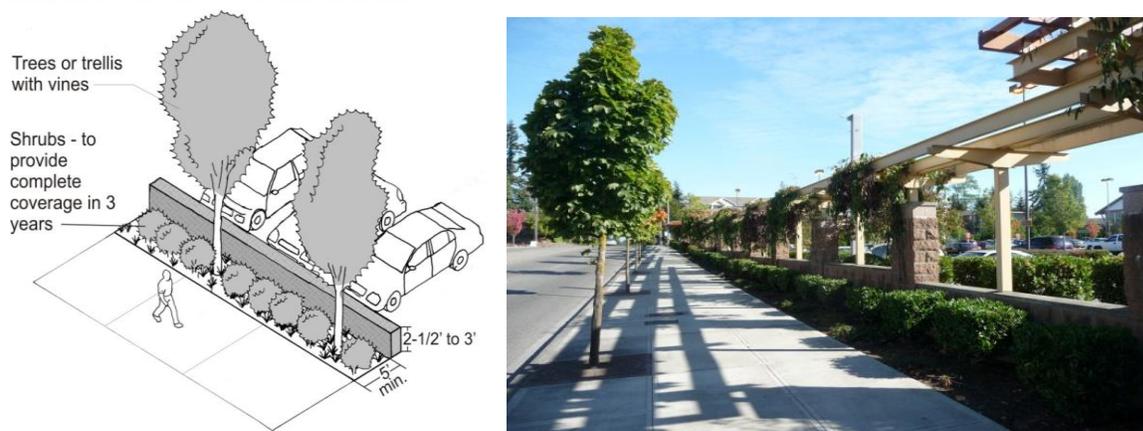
B.12: Parking area planting buffer with low wall and landscaping. Illustration with trees (left) and example with trellis (right).
